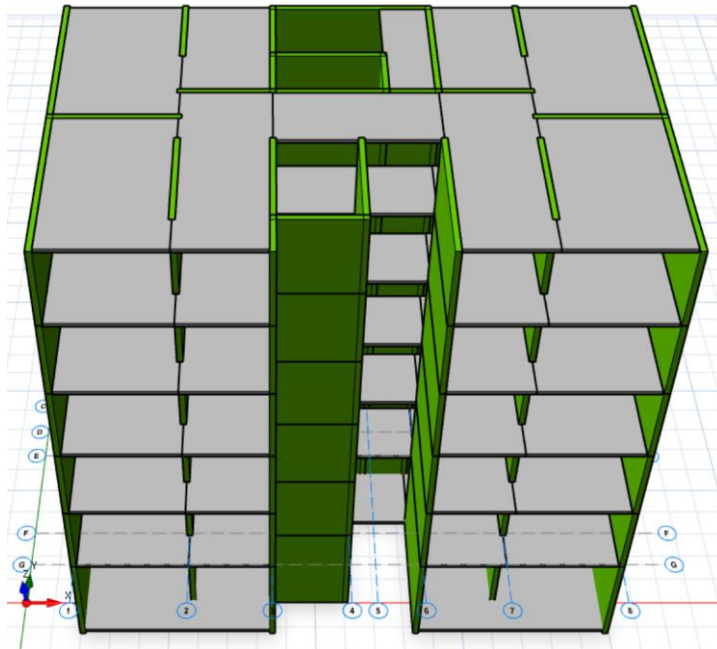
RC5 Model (Reinforced Concrete Model - 5 Floors with 1 Basement)
